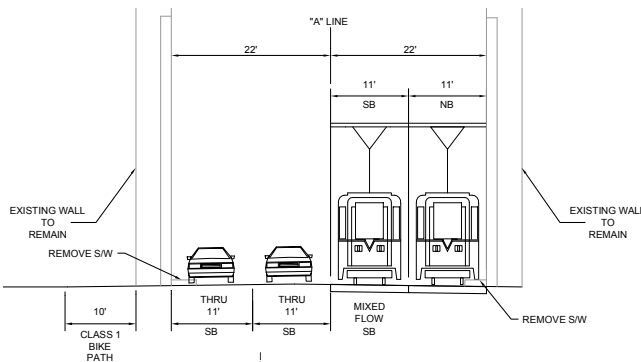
7th Street Between F Street and UPRR Crossing (looking north)
